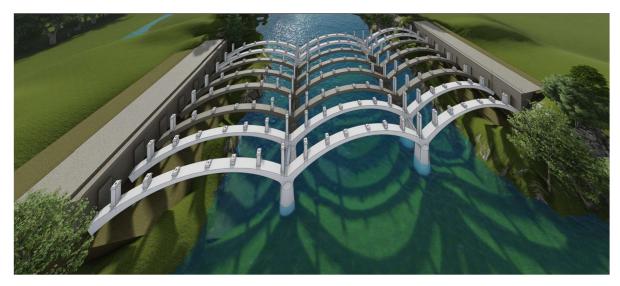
Install New Arch Ribs, Spandrel Columns and Extend Abutments
